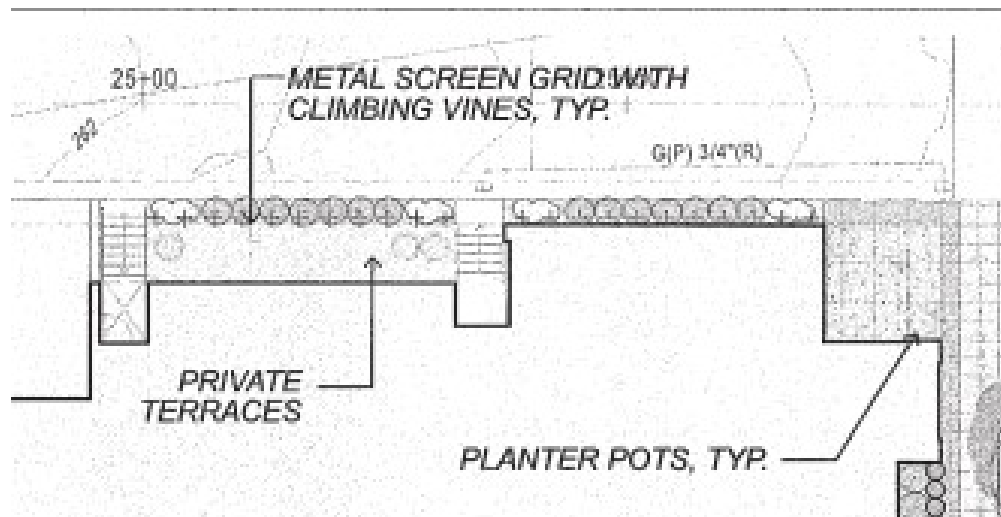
Green Façade Design example, adopted from SGF case study, Link Apartment Landscape Plans
